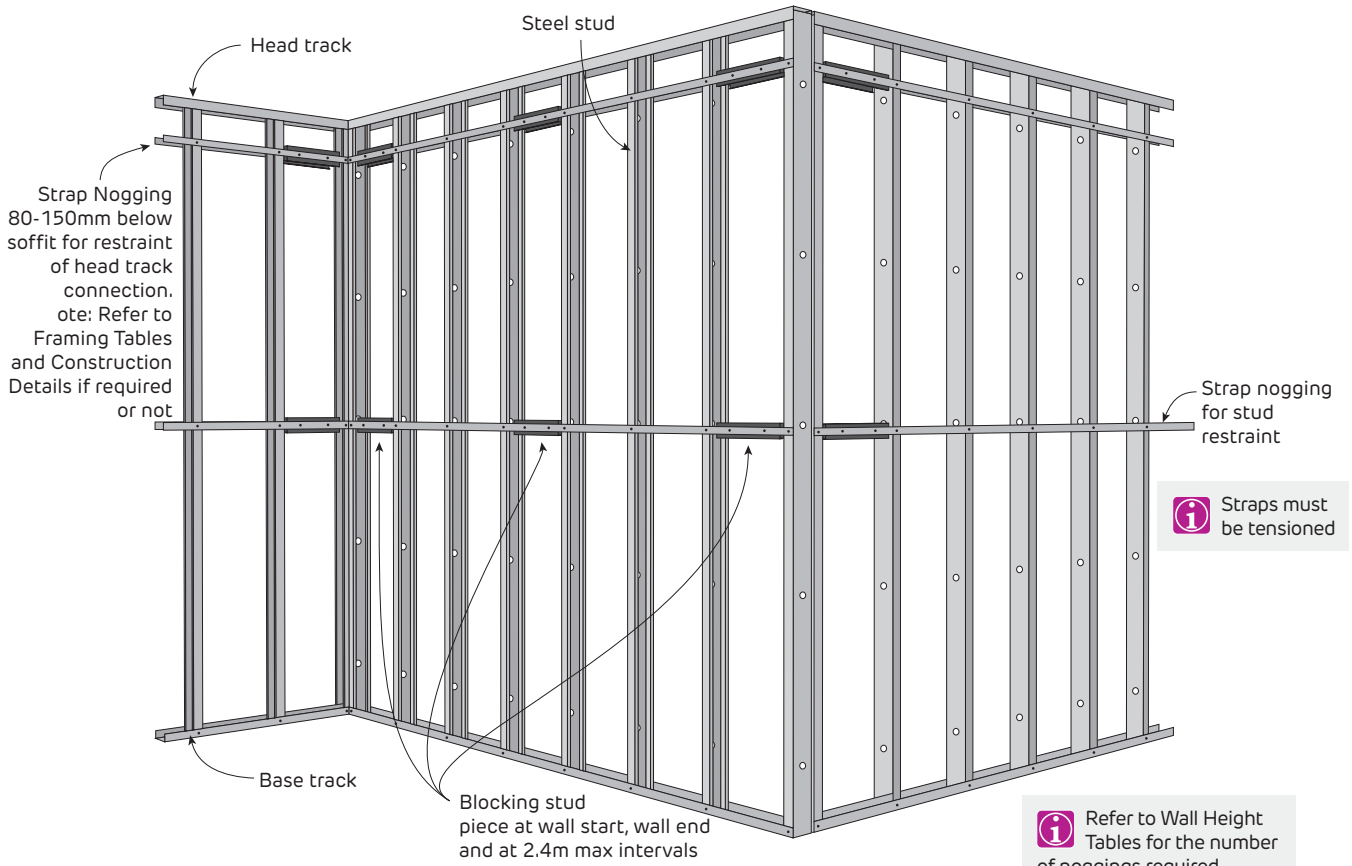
Steel Stud Frame with Strap and Block Nogging
